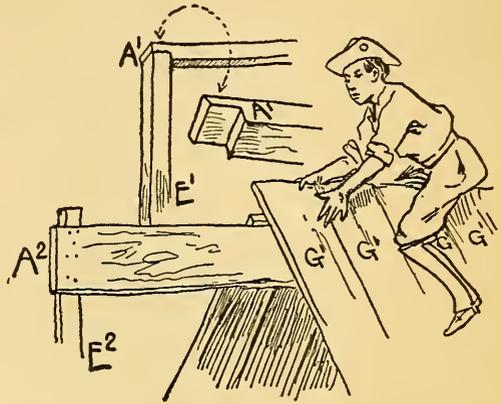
Two Ways of Fixing the Roof-Tree for a Board Roof
